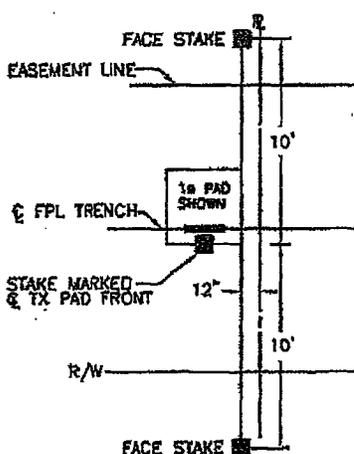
FRONT LOT URD CONSTRUCTION FACE STAKING
